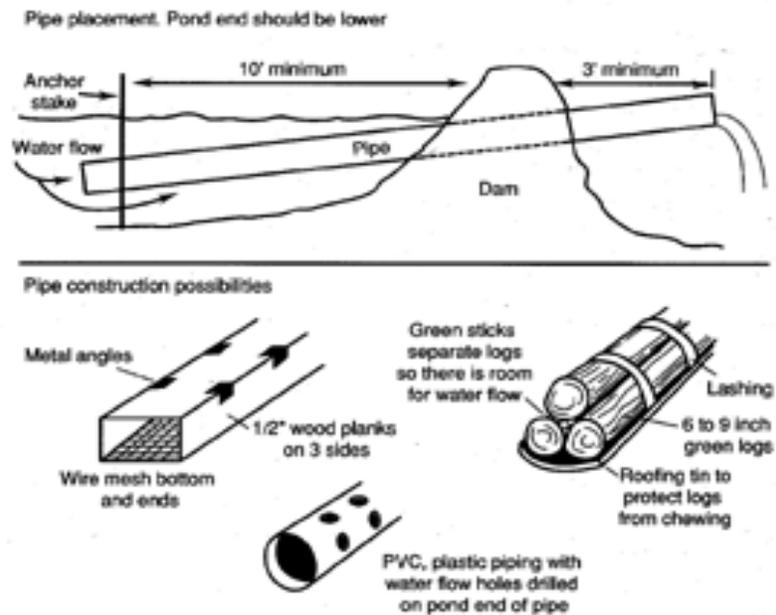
shows a method of installing pipes or troughs in beaver dams in order to control the water level in the pond. Several possible pipe construction methods are also shown. Details of “beaver pipe” construction are found in the article “A Device For Control Of Problem Beavers” (Journal of Wildlife Management, Vol. 27, No. 3, July 1963, by H.A. Laramie). The costs include lumber to make the pipes (or the cost of PVC piping) and labor to install them. This is a more difficult device to install than a fence or baffle, however, it may be the only option where there is no culvert to use as a “backstop”. Most landowners do not resort to this method unless the damage is substantial.
